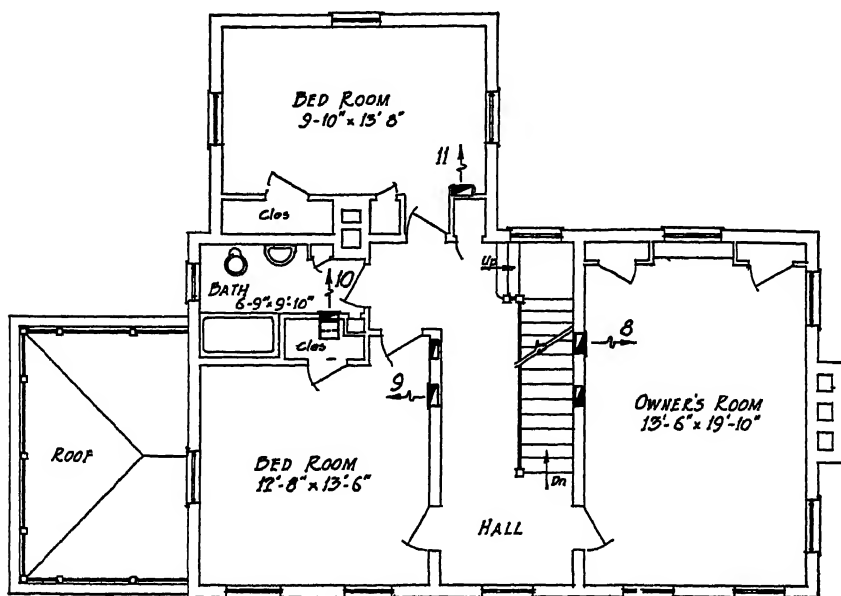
SECOND-FLOOR PLAN, RESEARCH RESIDENCE
